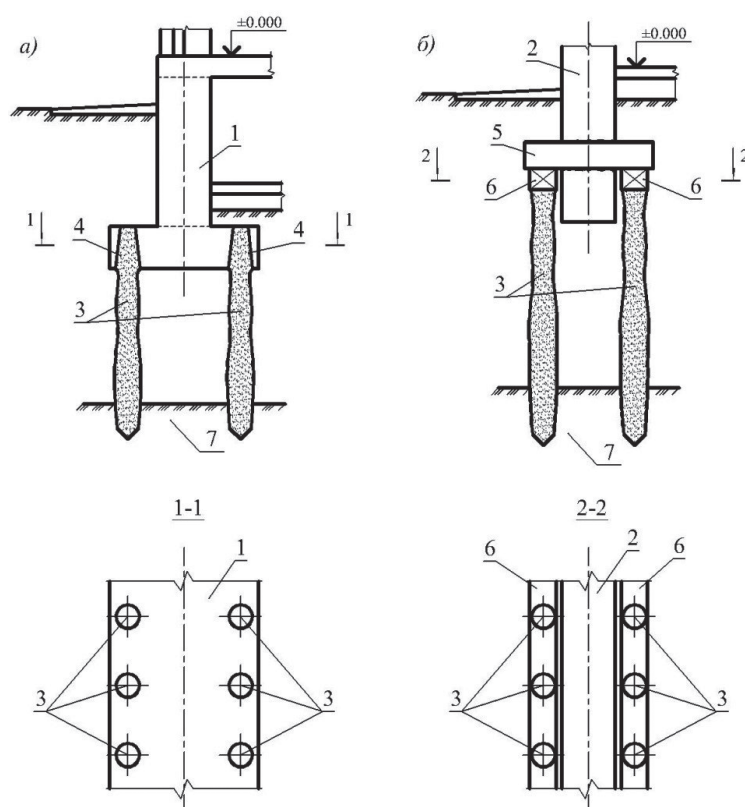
Methods for arranging injection piles when reinforcing strip foundations of reconstructed buildings: a, b – respectively, under the sole of the existing strip foundation and adjacent to its perimeter; 1 – existing strip monolithic reinforced concrete foundation; 2 – existing strip rubble (brick) foundation; 3 – injection pile; 4 – a tapered hole in the slab part of the existing foundation; 5 – transverse metal beam, arranged through a hole in the wall part of the existing strip foundation; 6 – longitudinal reinforced concrete beam; 7 – bearing layer of solid (low-compressive) soil
